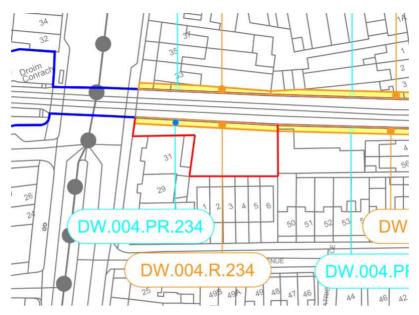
Extract from Drawing Number 004 "Property Plan No. DW004" of the Railway Order Application showing extent of proposed right of way in yellow (Site boundary added in red line by SLA).
